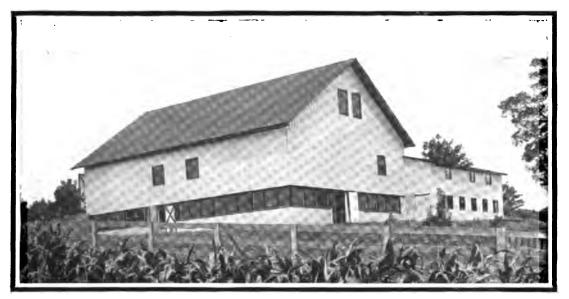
TENNESSEE DAIRY BARN (ELEVATION).
